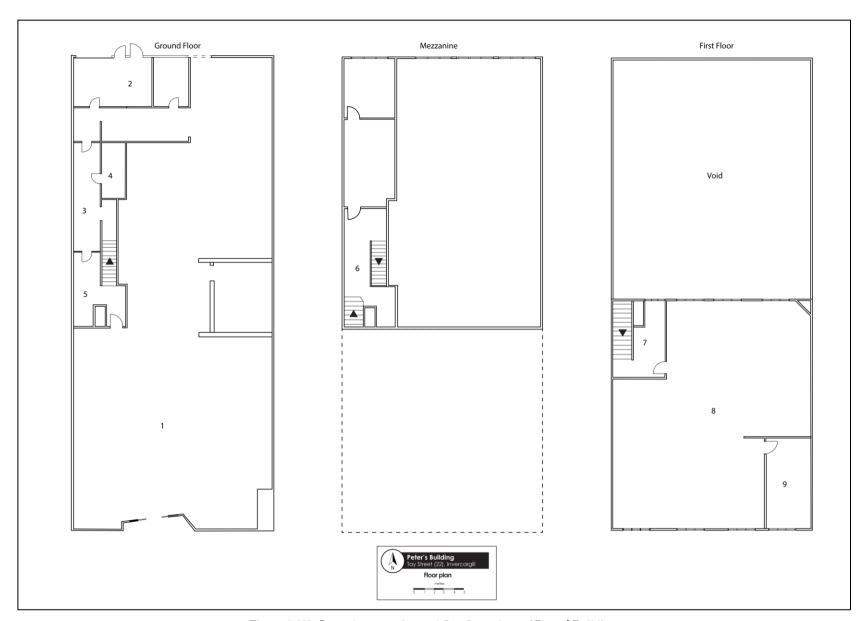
Ground, mezzanine and first floor plans of Peters' Building.
